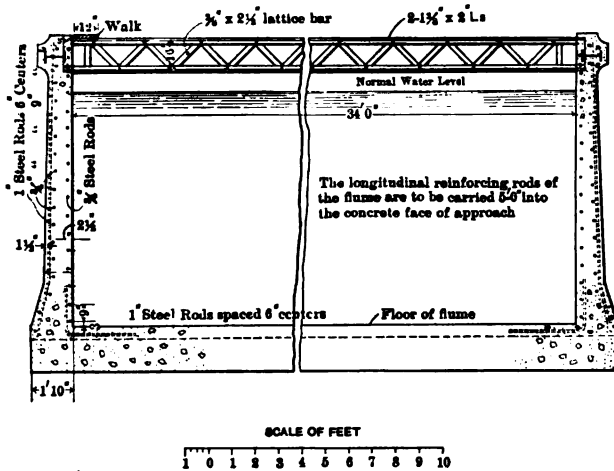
Section Through Reinforced Concrete Aqueduct, Interstate Canal, Nebraska-Wyoming.
